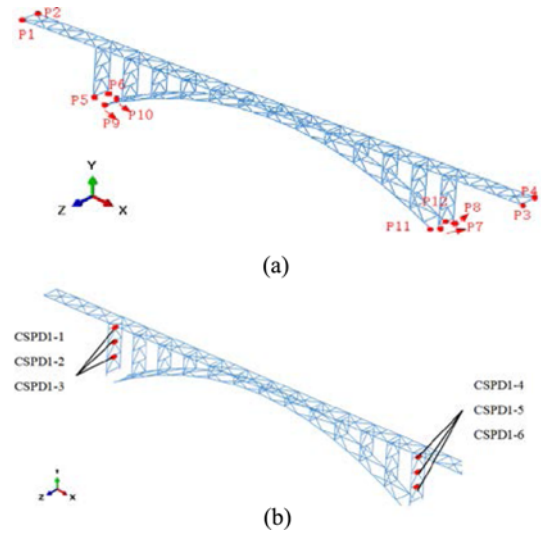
Finite Element Models of the Upper-Deck Type Steel Truss Arch Bridge: (a) Original Arch Bridge, (b) Arch Bridge-CSPD
